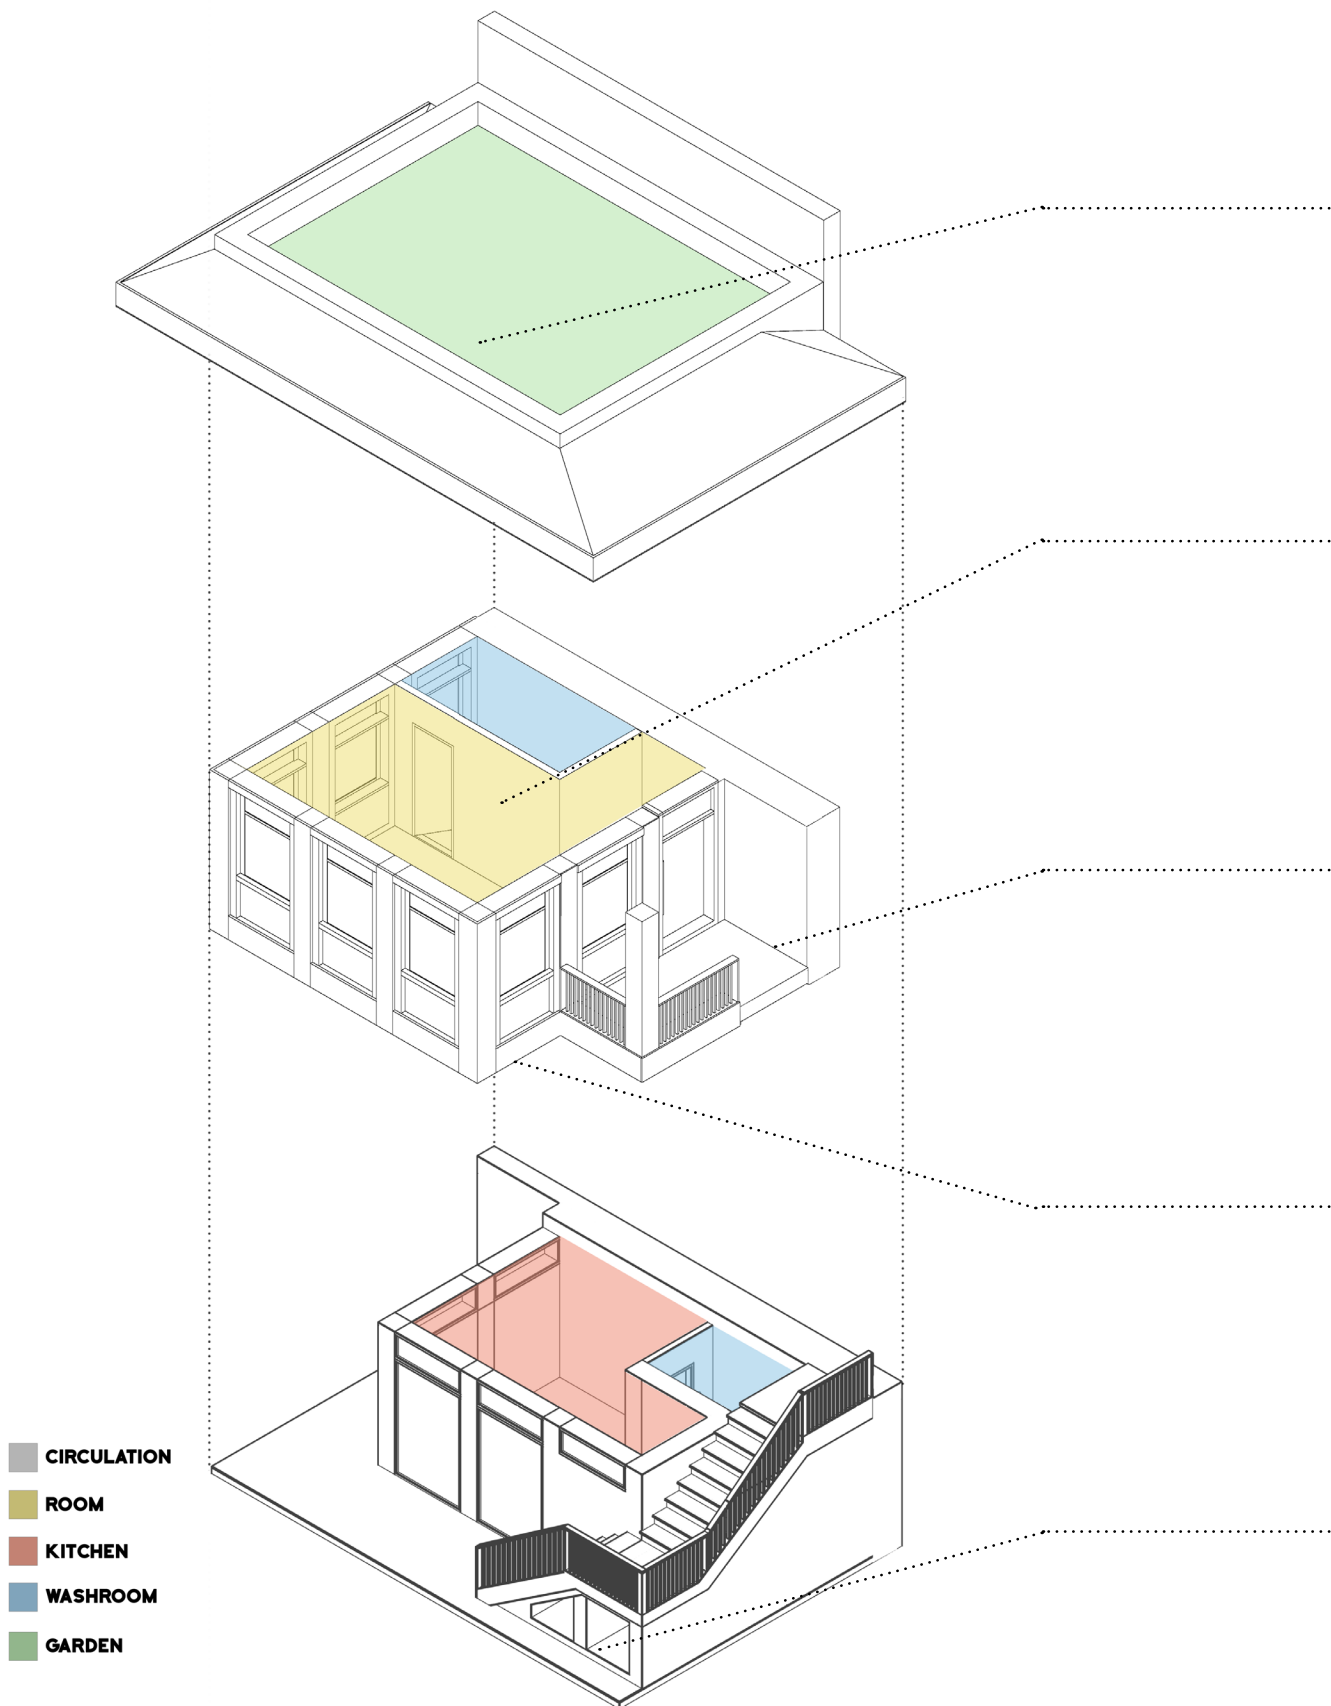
Black Sea Kosk, exploded axonometric / program drawing.
